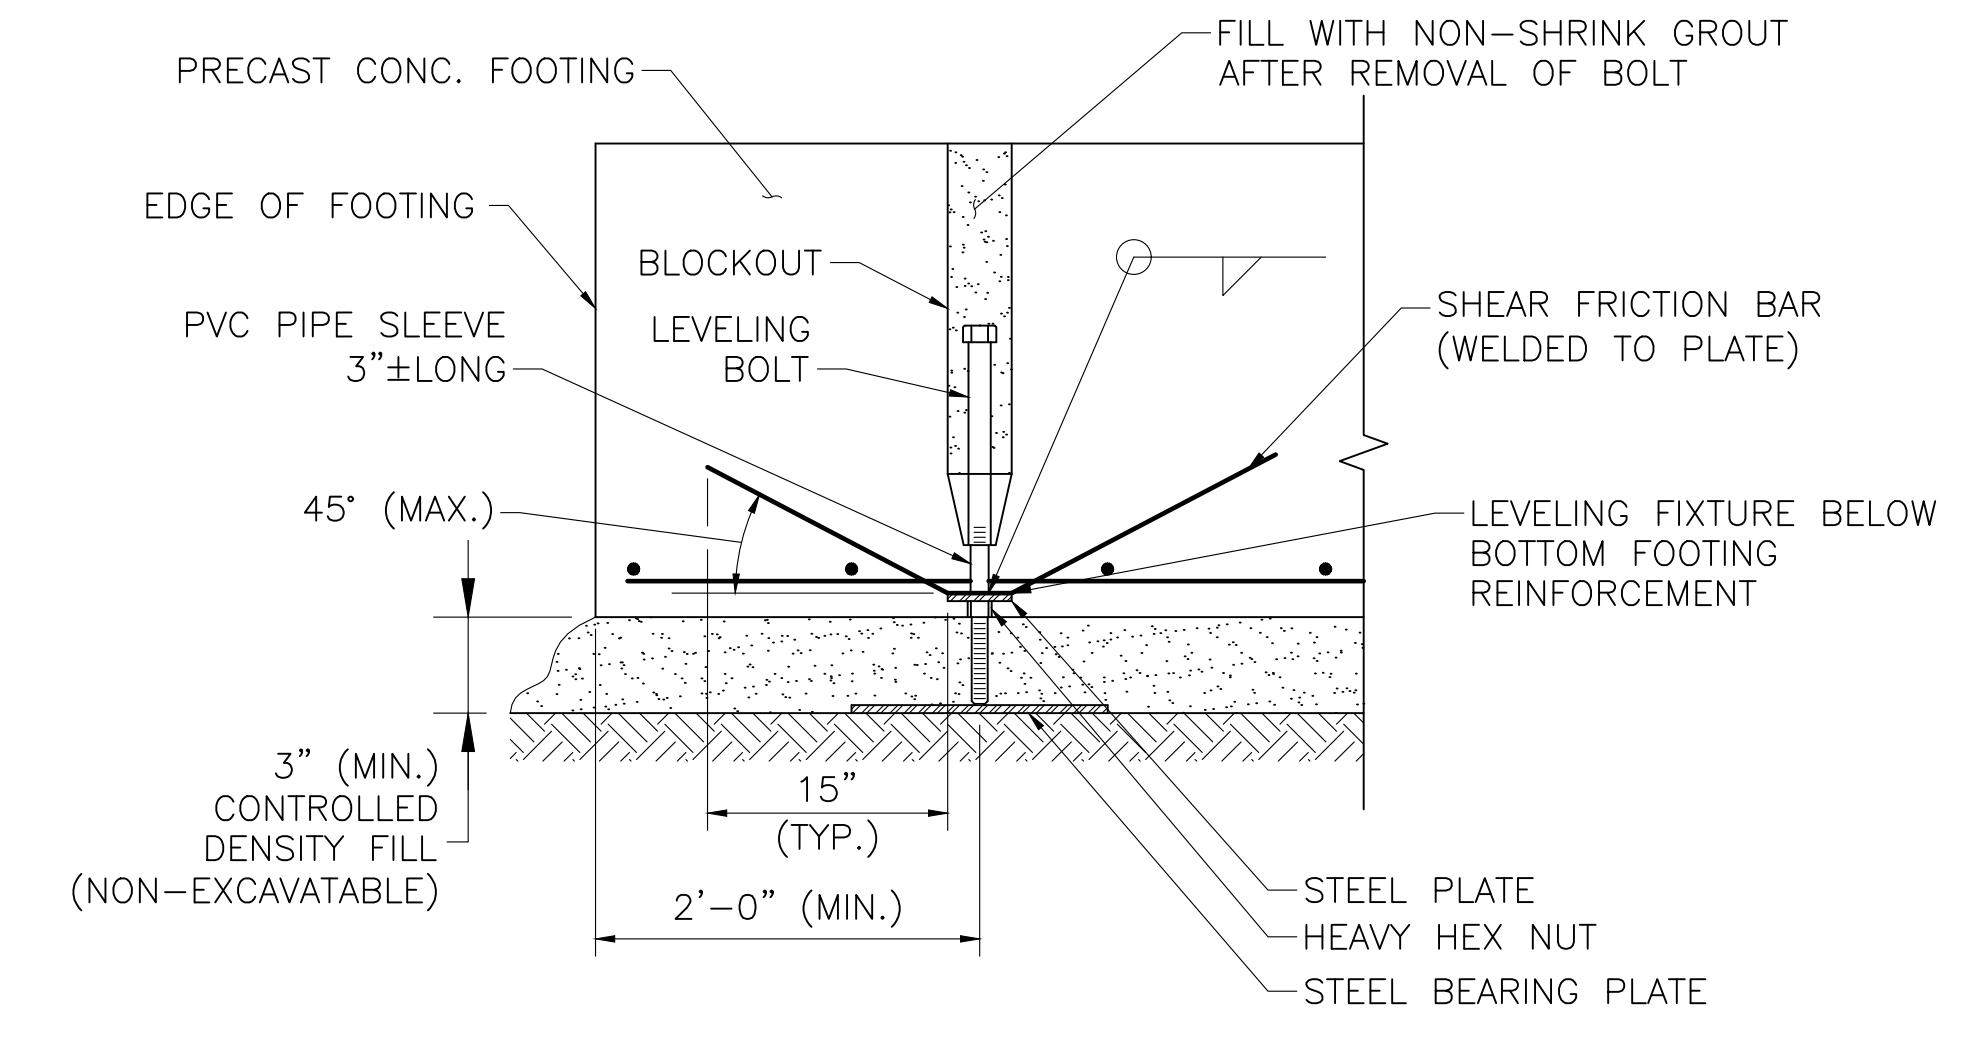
DETAILS AT ABUTMENT - ROADWAY SECTION
